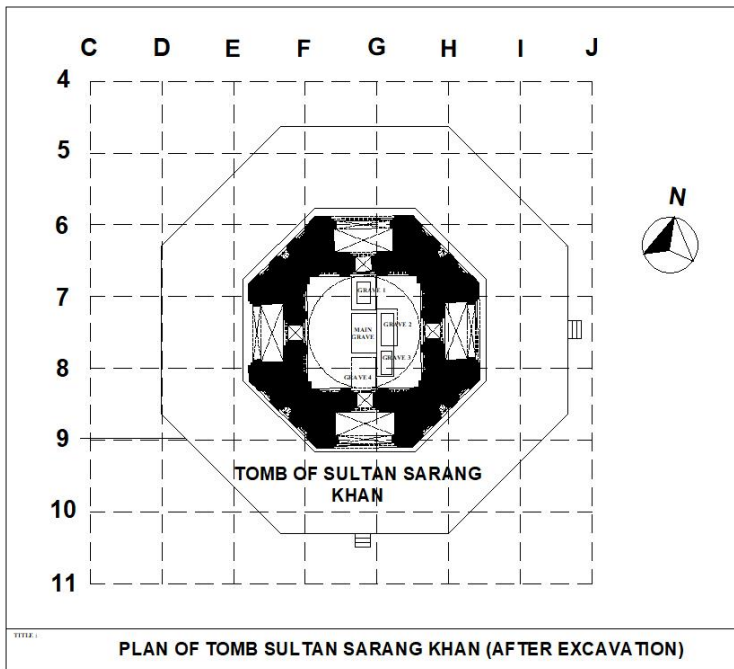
Plan of Mausoleum Sultan Sarang Khan (After Excavations).
